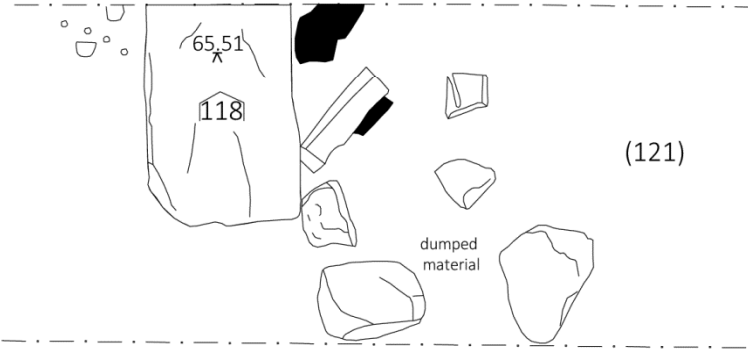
Ground beam trenches area 8-10 – plans and sections (scale 1:25)
